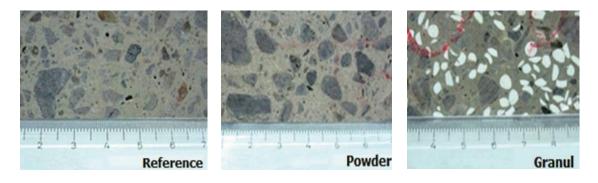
The Cross Section of Concrete with PVC Waste [39].
